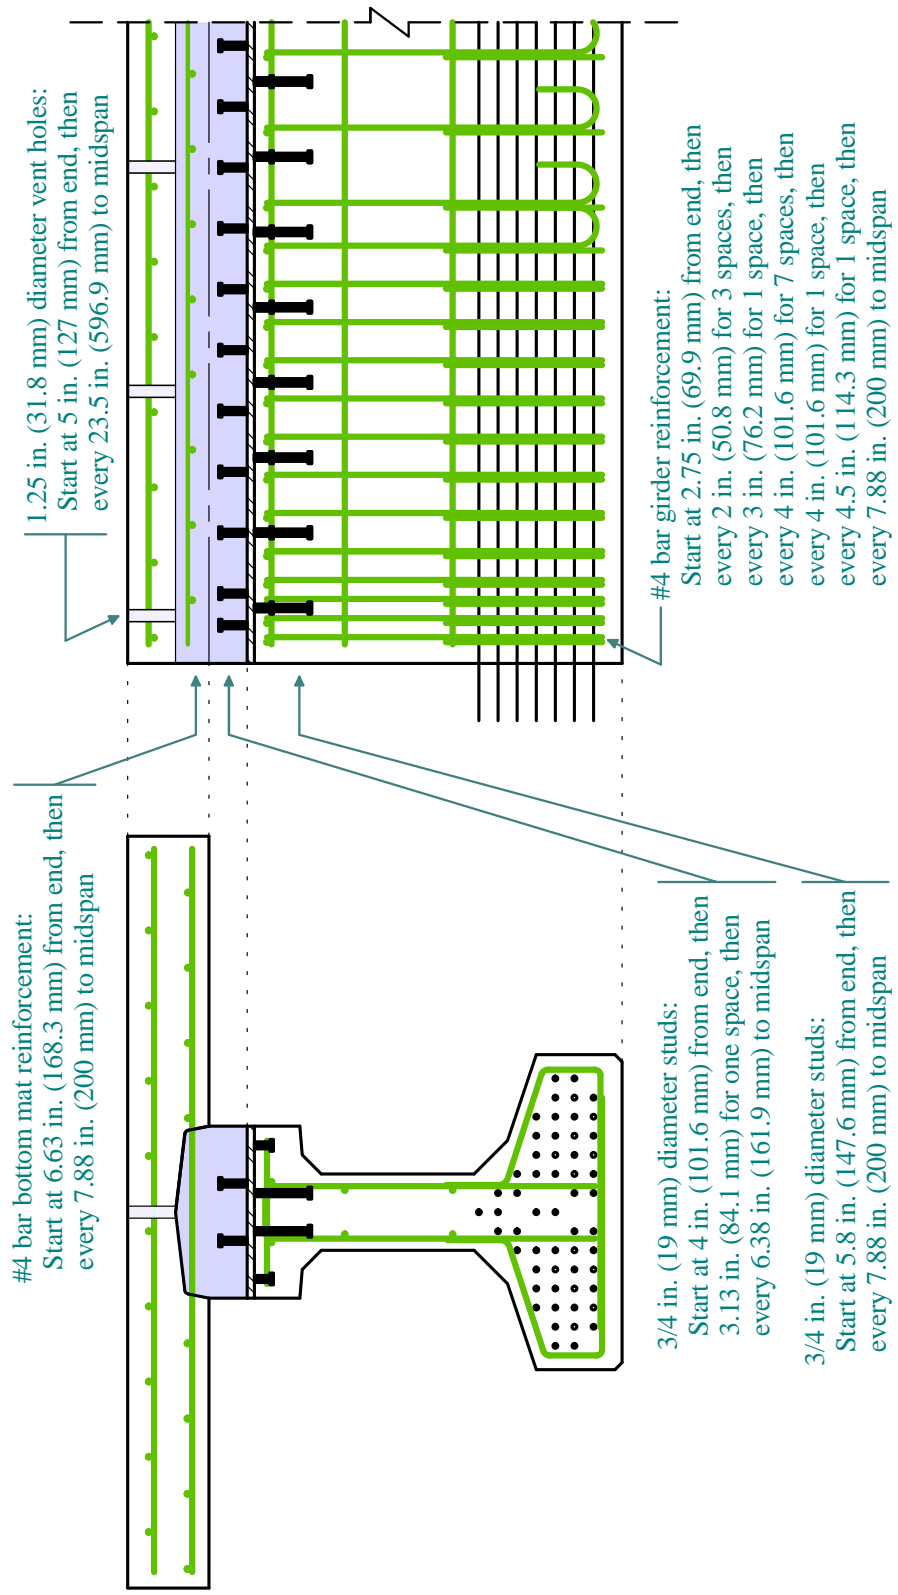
Illustration. UHPC composite connection: Longitudinal cross section of emulative steel girder connection.
